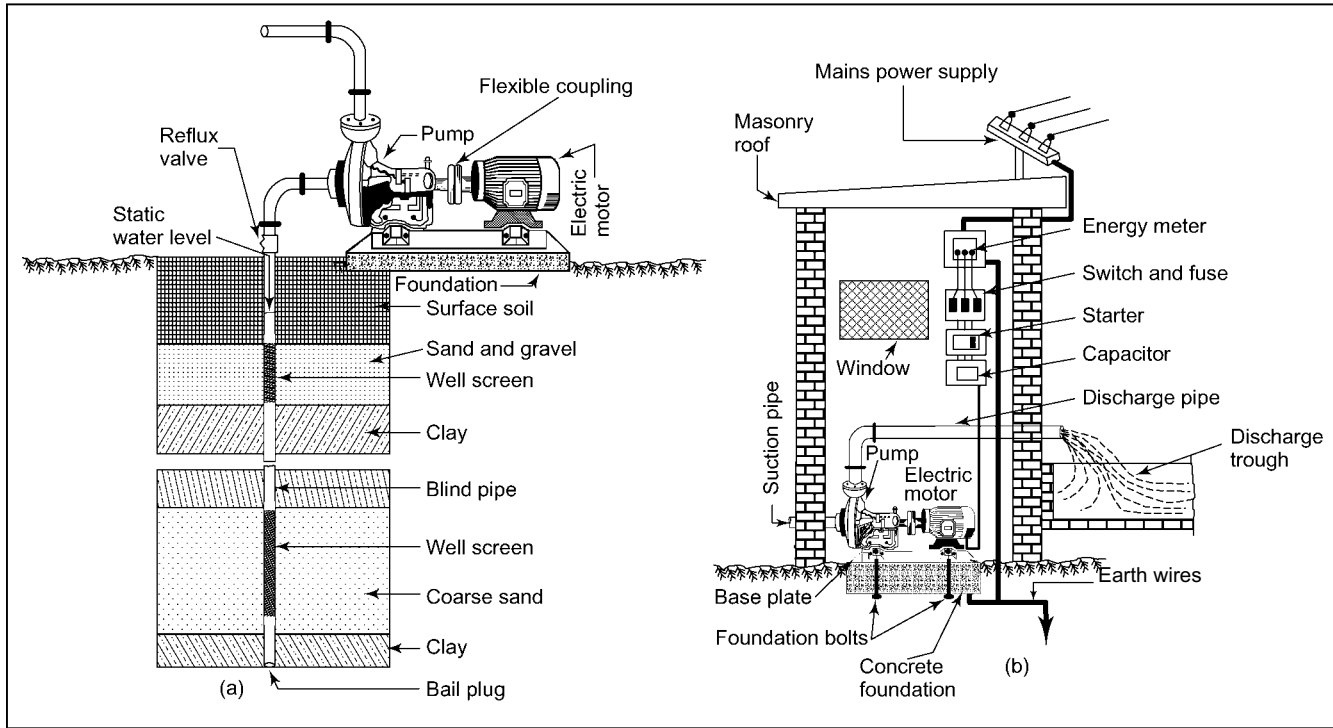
Typical installation of electric motor driven horizontal centrifugal pumps in tube wells.
